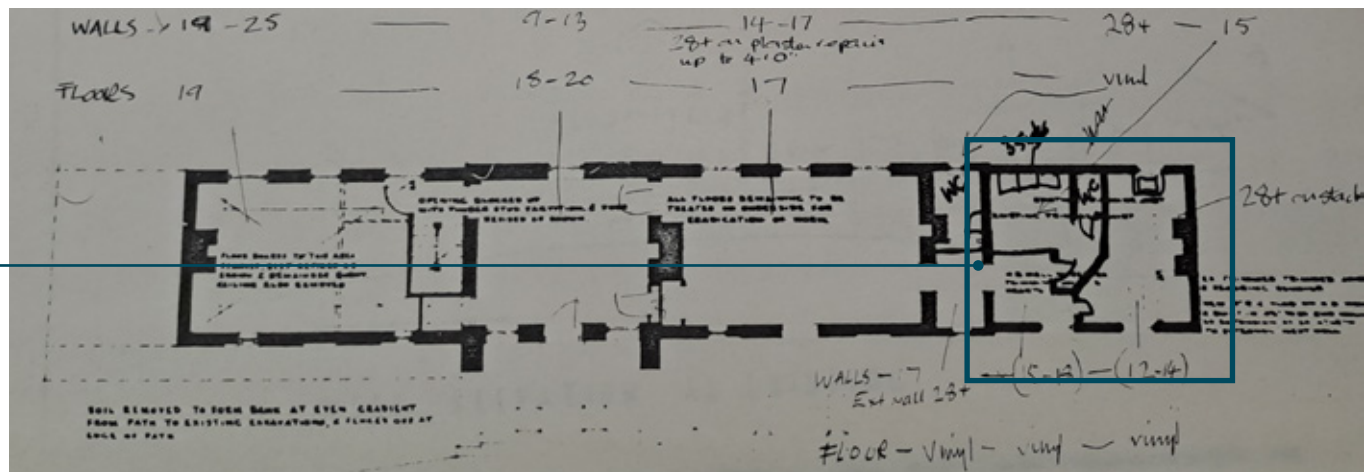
First floor plans from 1957 showing the intent to create public conveniences on the first floor. City of London Corporation, HB/TEM/10
